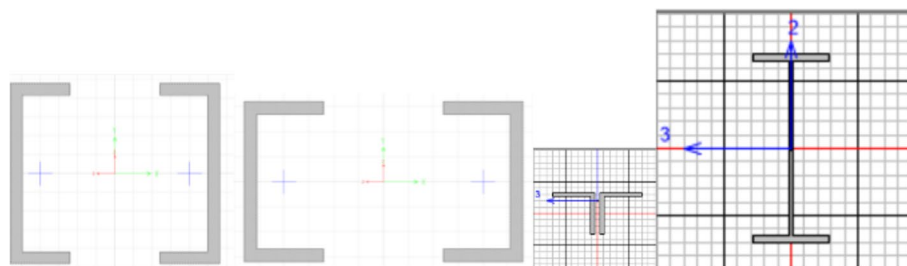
Typical sections of members TBCH, CGCH, DCB, DCH (rolled section type), (left to right)
